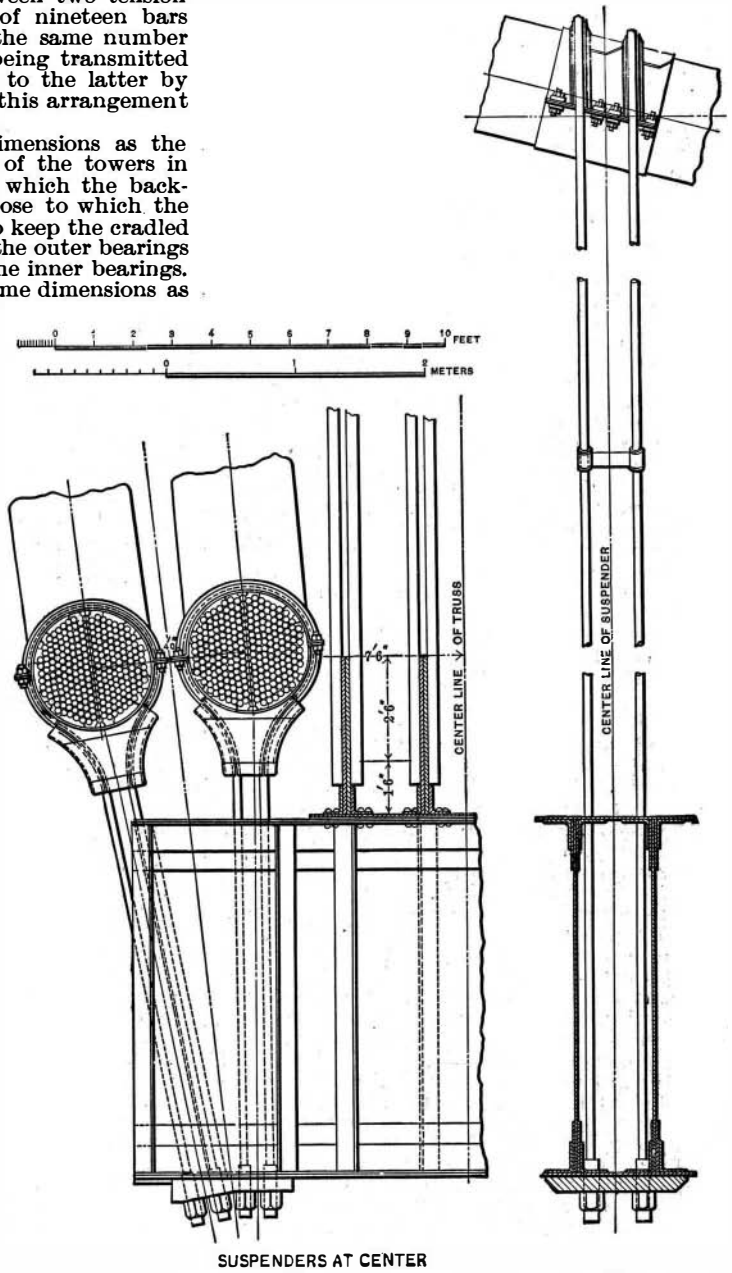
PLATE V.—METHOD OF ATTACHING SUSPENDERS TO CABLES AND FLOOR BEAMS.
